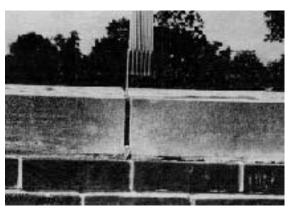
Figure C. Cap parapet walls with stone, metal, or tile. But be sure to seal the joints. If sealant is not maintained, mortar deteriorates.
